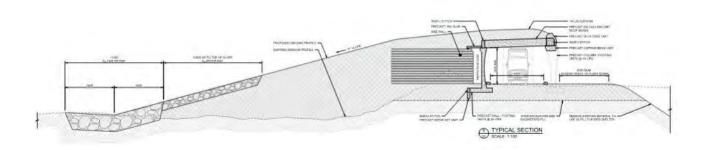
Preliminary design sketch of the proposed avalanche shelter
